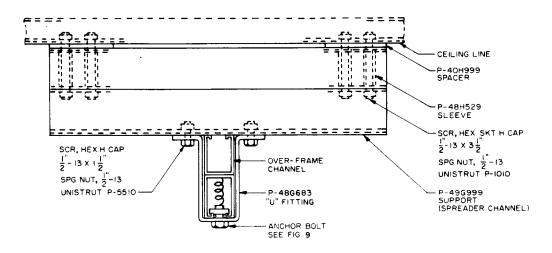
Fastening Overframe Channel—Using Spreader Channel Between Ceiling and Overframe Channel—Single Lineup 1400- to 2000-Pound Bays (A&M Only)
